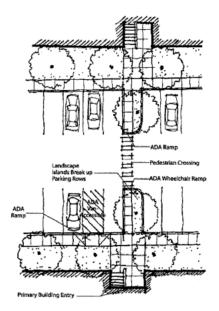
(6): Pedestrian Walkway Detail (Typical)
